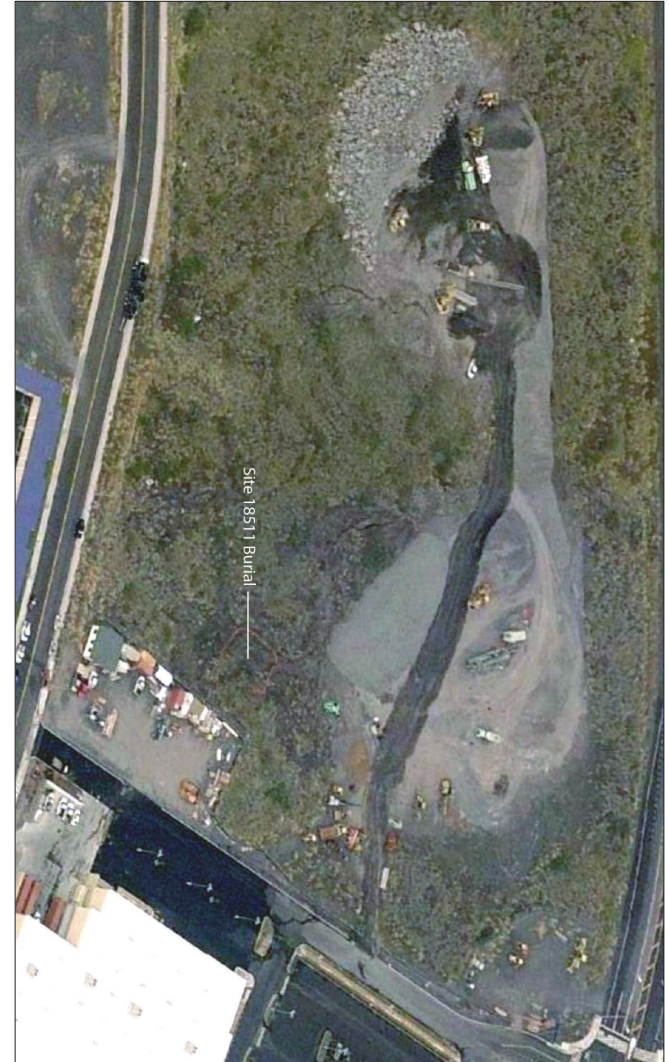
Previous ground-disturbing activities conducted north and west of the Site 18511, Feature C burial. Orange construction fencing is visible surrounding the 30-foot site buffer (view west) (Oblique aerial photograph from Bing Aerials, date unknown).
